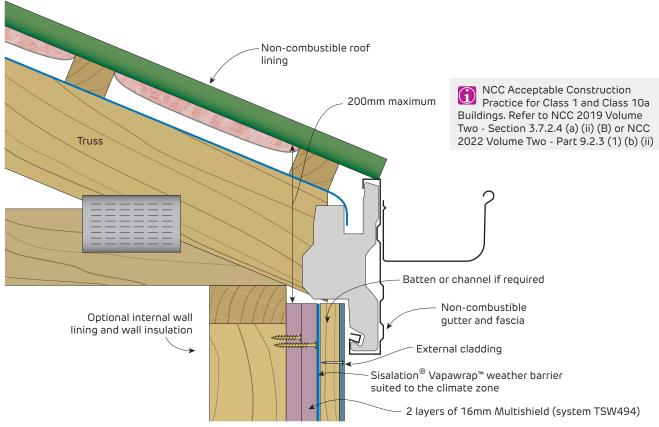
External Timber Wall to Non-combustible Gutter and Fascia
